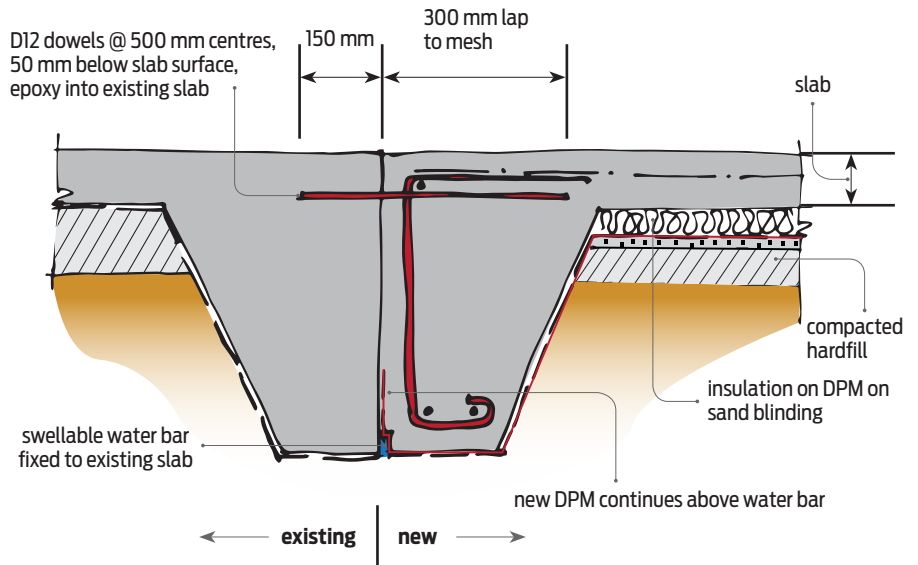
DPM to existing slab is damaged, dirty or unprotected.
